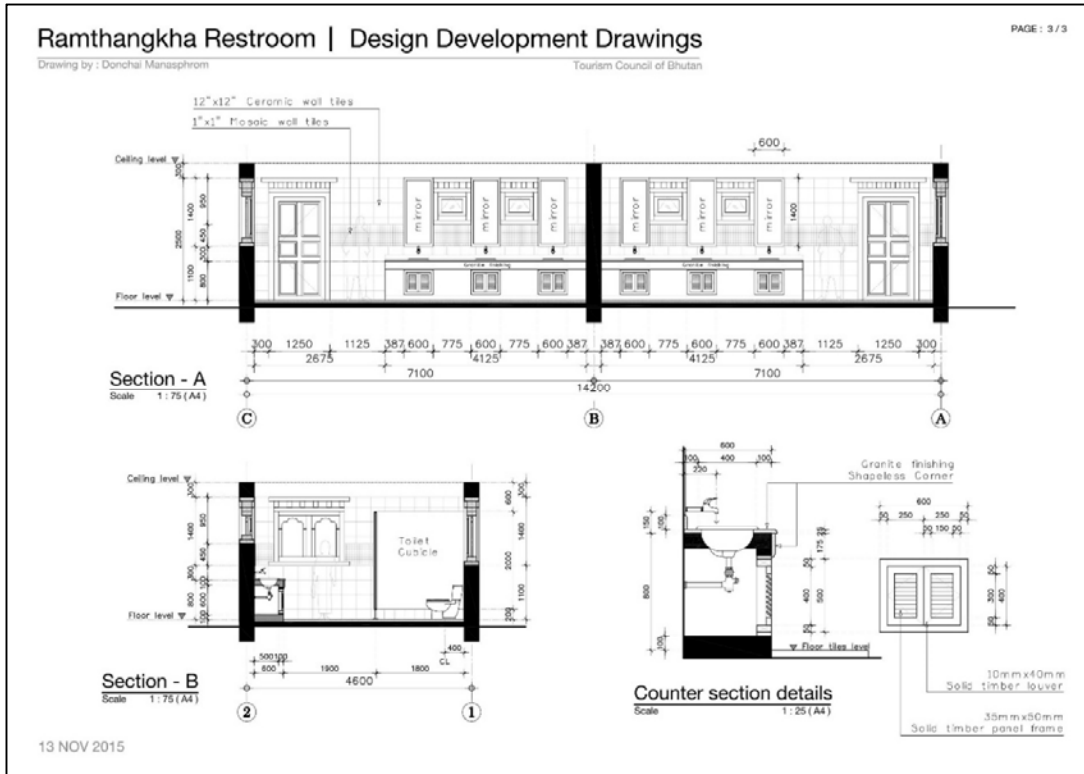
Renovation drawings of Ramthangkha (Taksang base) restrooms
